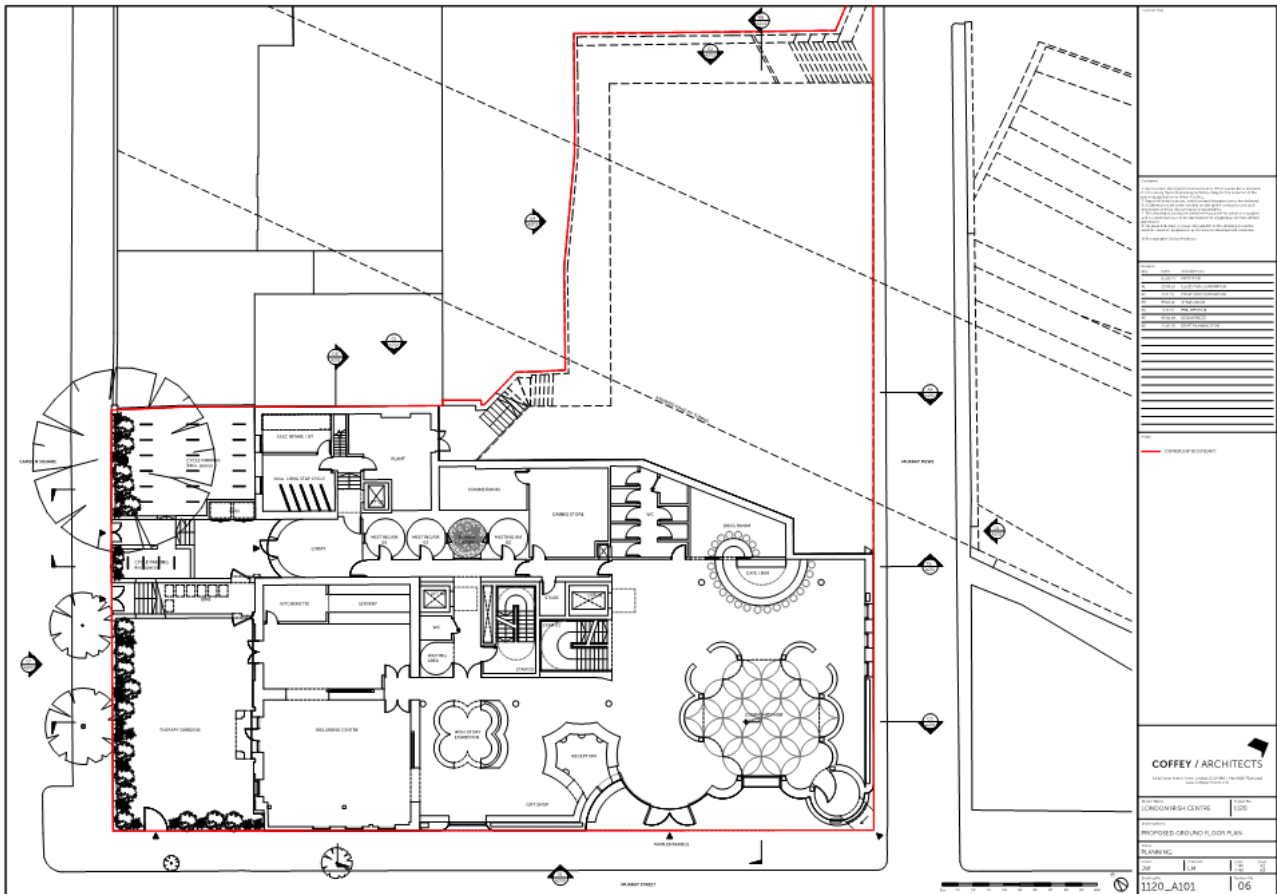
Proposed Site Plan (indicative only) Ground Floor Plan- Source document: Coffey Architects. Drawing No.: 1120\_A101. Rev.: 06
